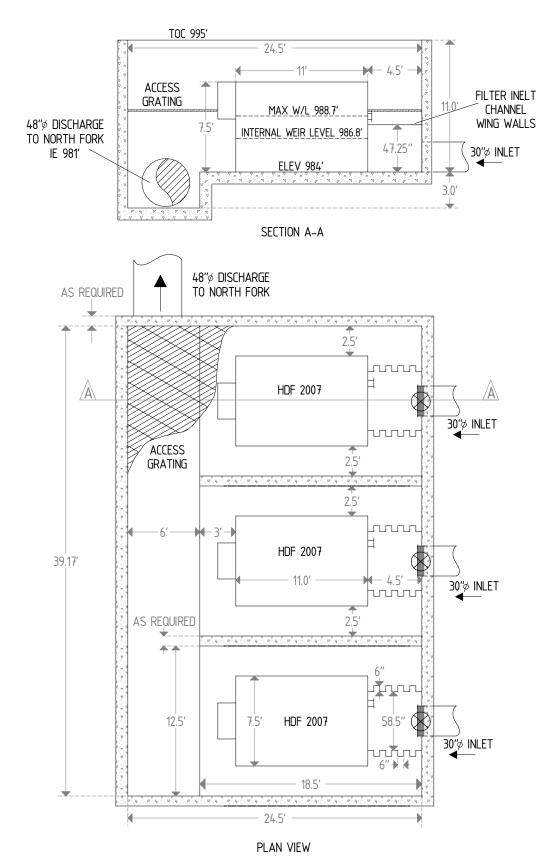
Plan and section views of the proposed Chinook raceway effluent treatment system.
